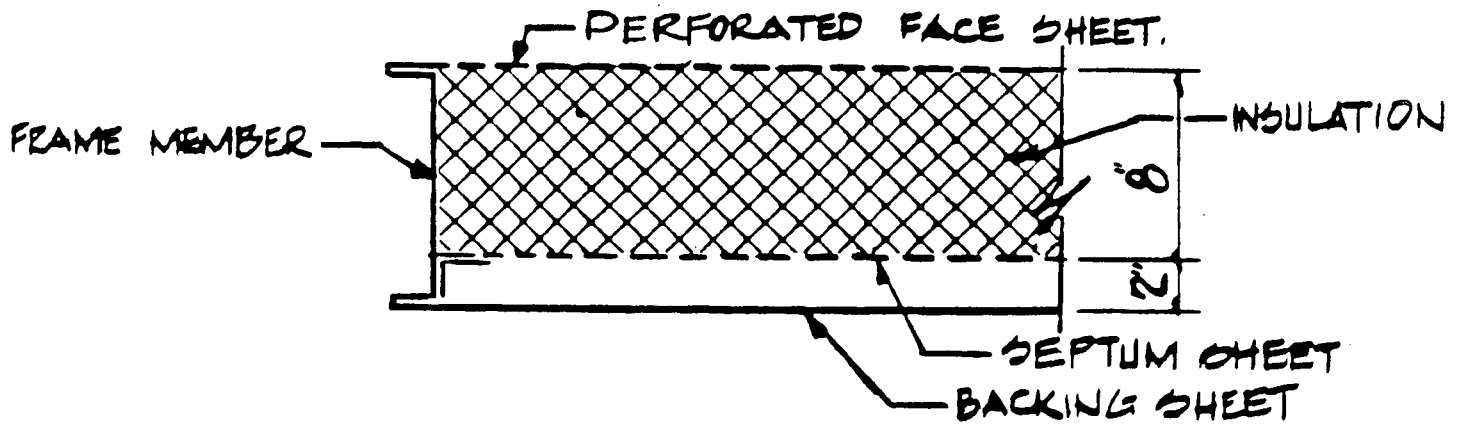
SECTION THROUGH TYPICAL WALL TREATMENT FOR B-1B GROUND RUN-UP NOISE SUPPRESSOR
